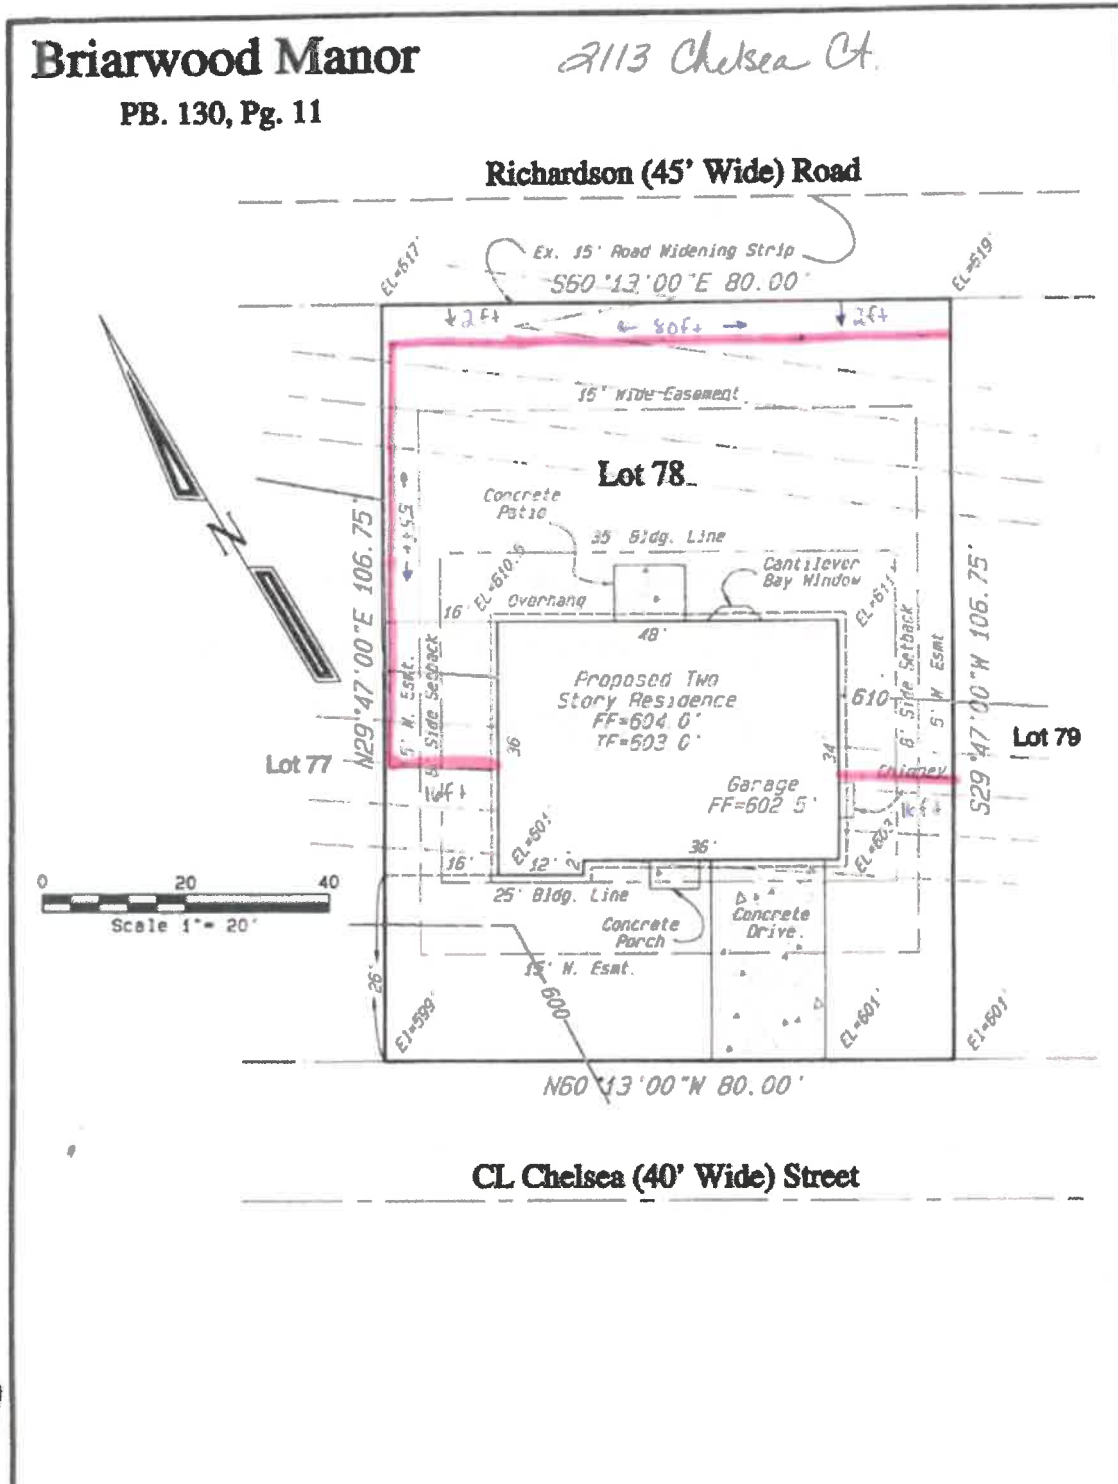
EXHIBIT A: SITE PLAN (PROPOSED FENCE HIGHLIGHTED)
